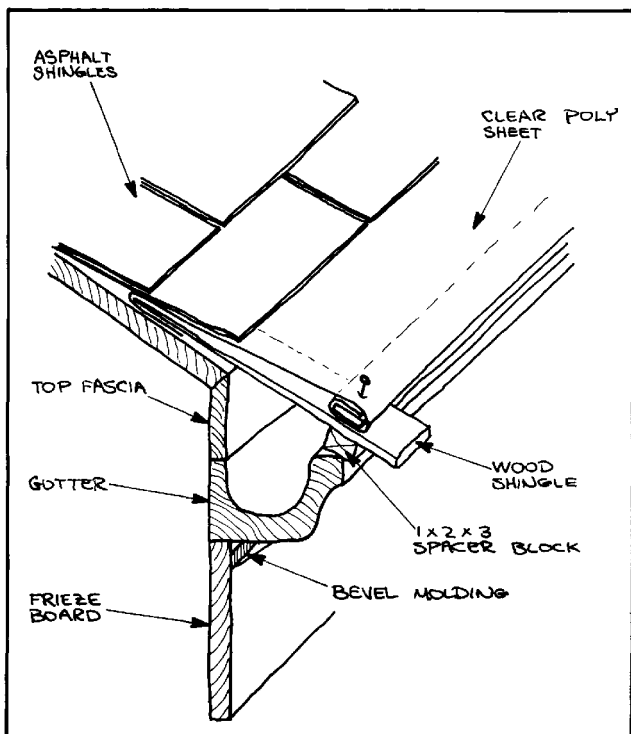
Temporary flashing. Waterproof protection may be needed to allow the gutter to dry out before treating it.
